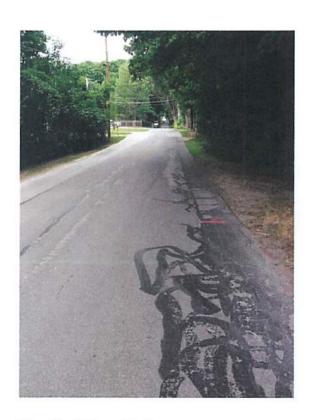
, 2, 3, & 4 - Patched Pavement Failure Areas with Potholes and Ruts
